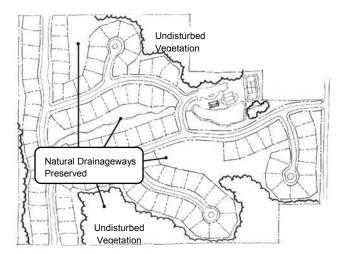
Example of a Subdivision Using Natural Drainageways for Stormwater Conveyance and Management
